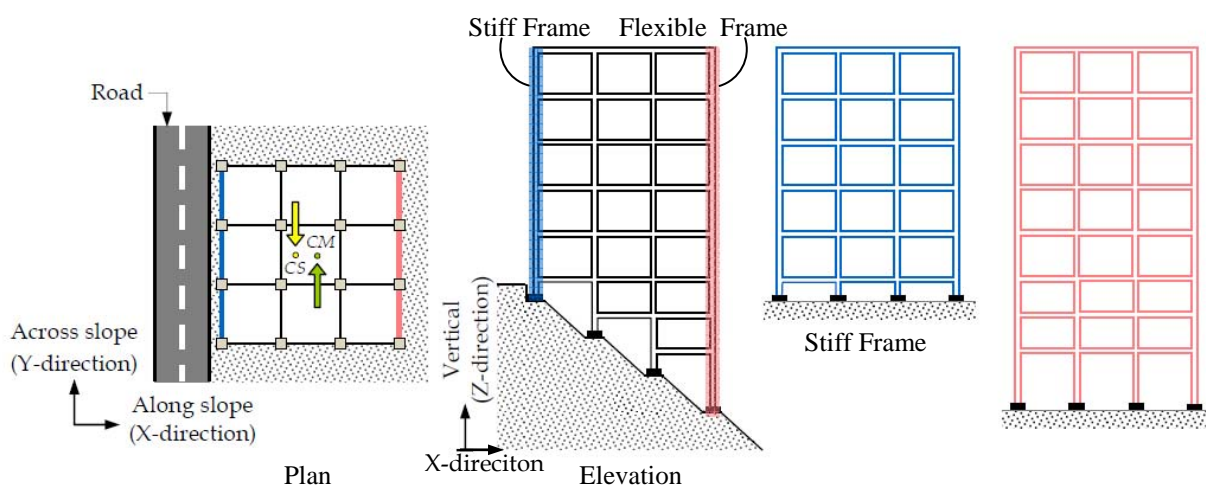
Plan and Elevation of a typical RC frame building on slope
